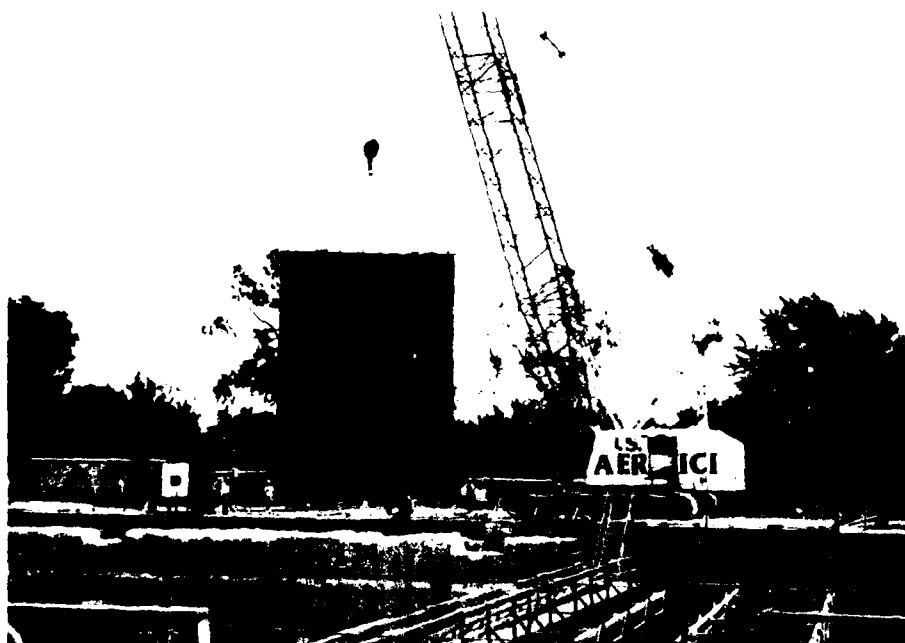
Concrete form being placed in position on the lock wall, Brandon Road Lock
